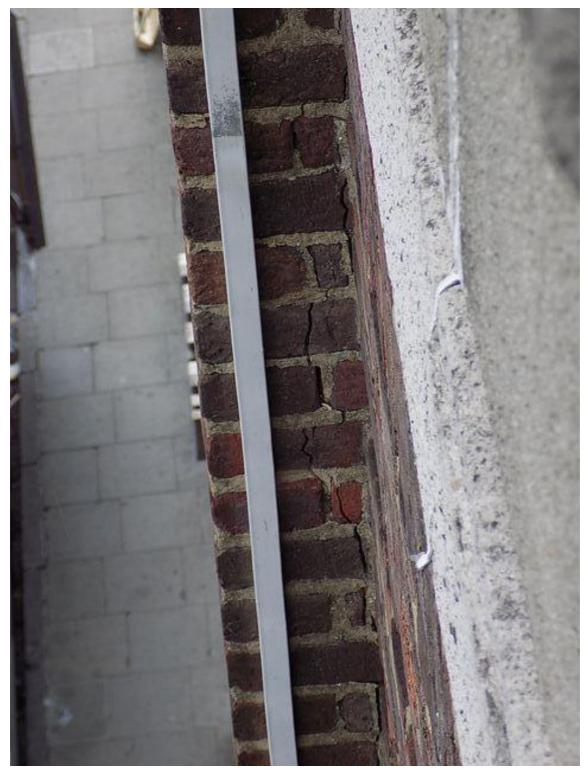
stress cracks in brick skin, presumably due to steel frame corrosion
